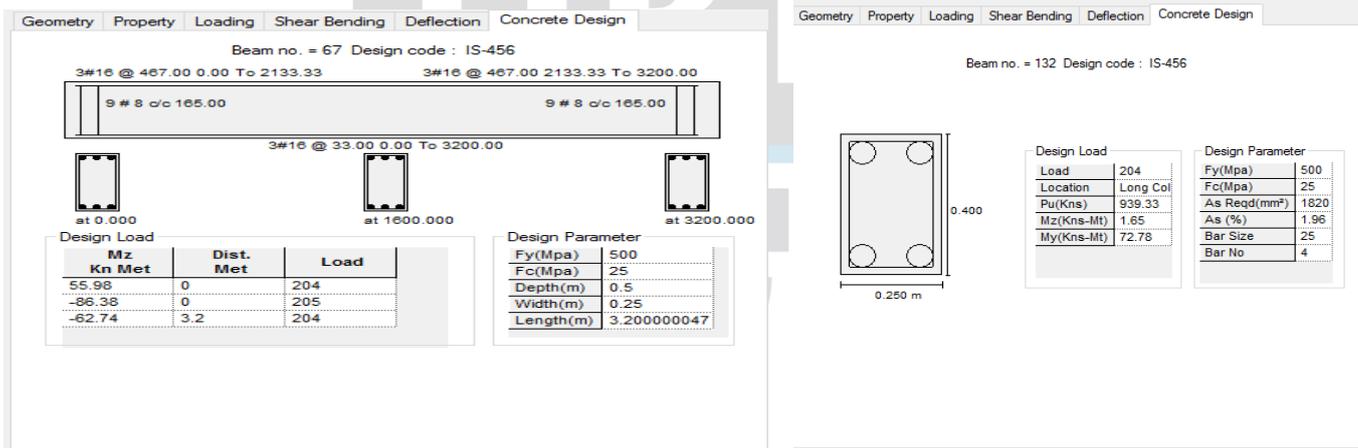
Detail Section of Beam and Column from STAAD file.
